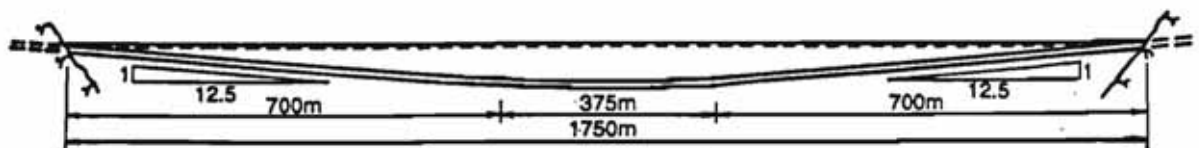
Section through fjord with abutment-anchored SFT spanning 1750m
